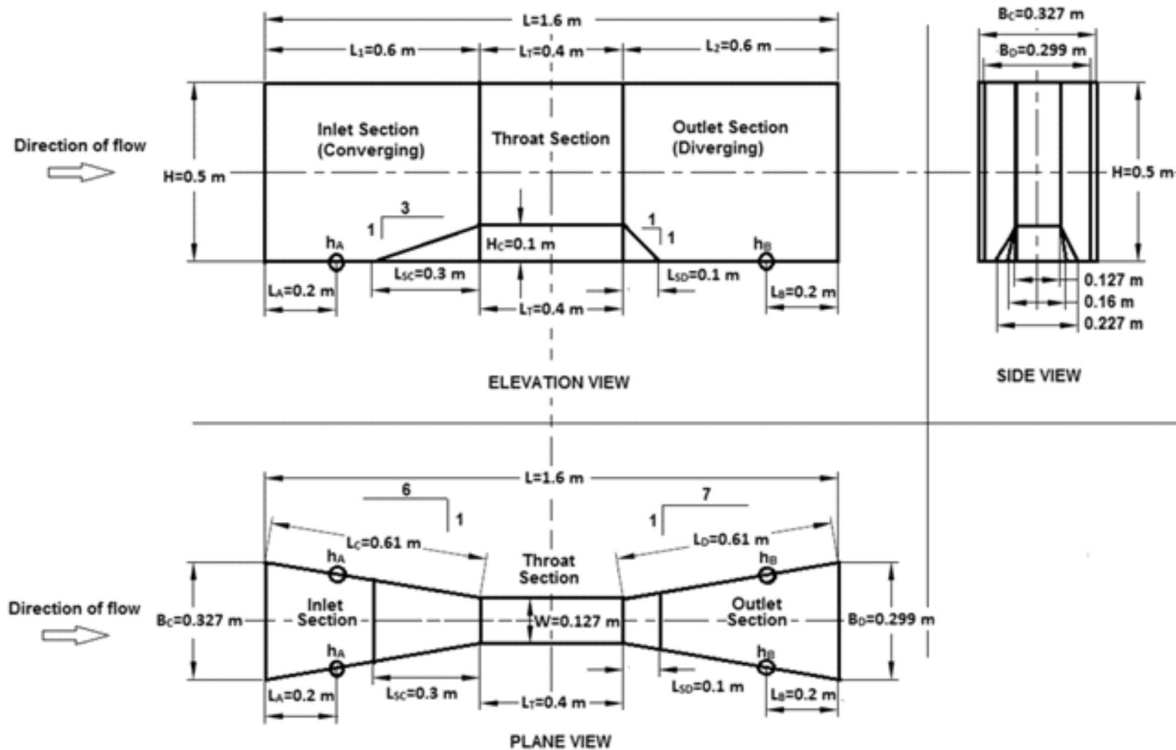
Complete layout of 0.127 m (5 inch) long-throat flume: (a) elevation view, (b) side view and (c) plan view.
